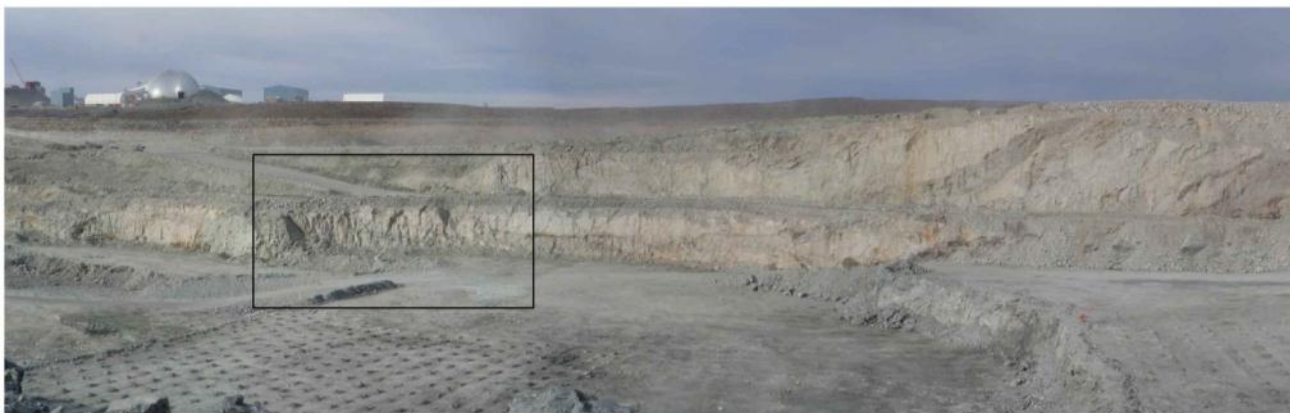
Pit B west wall showing the exposure of the fault in the lower bench
